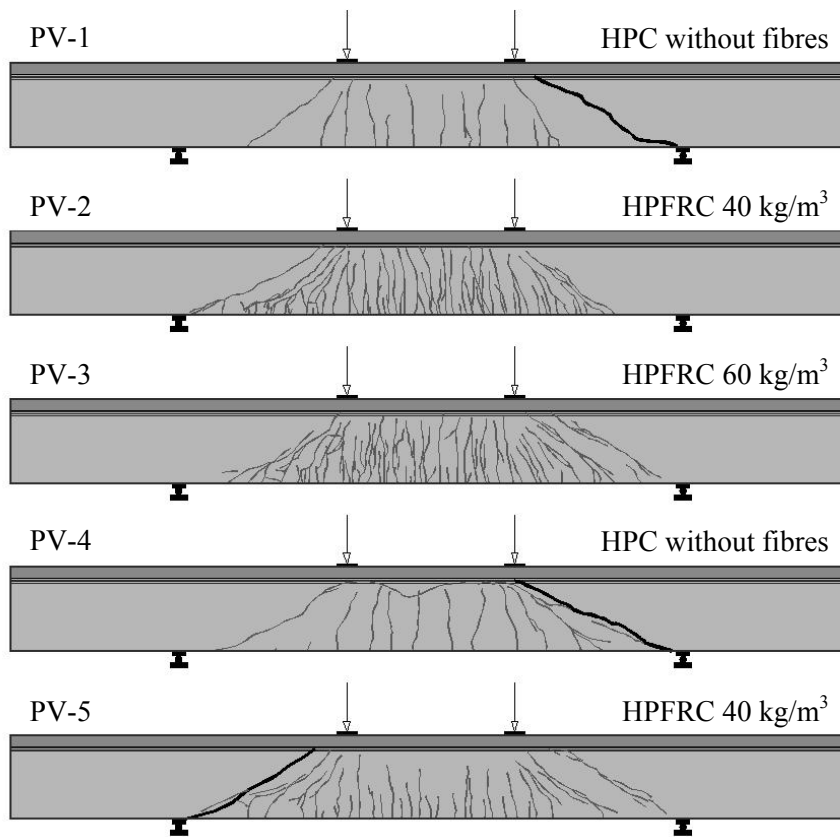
Cracking pattern of members PV-1 to PV-5
